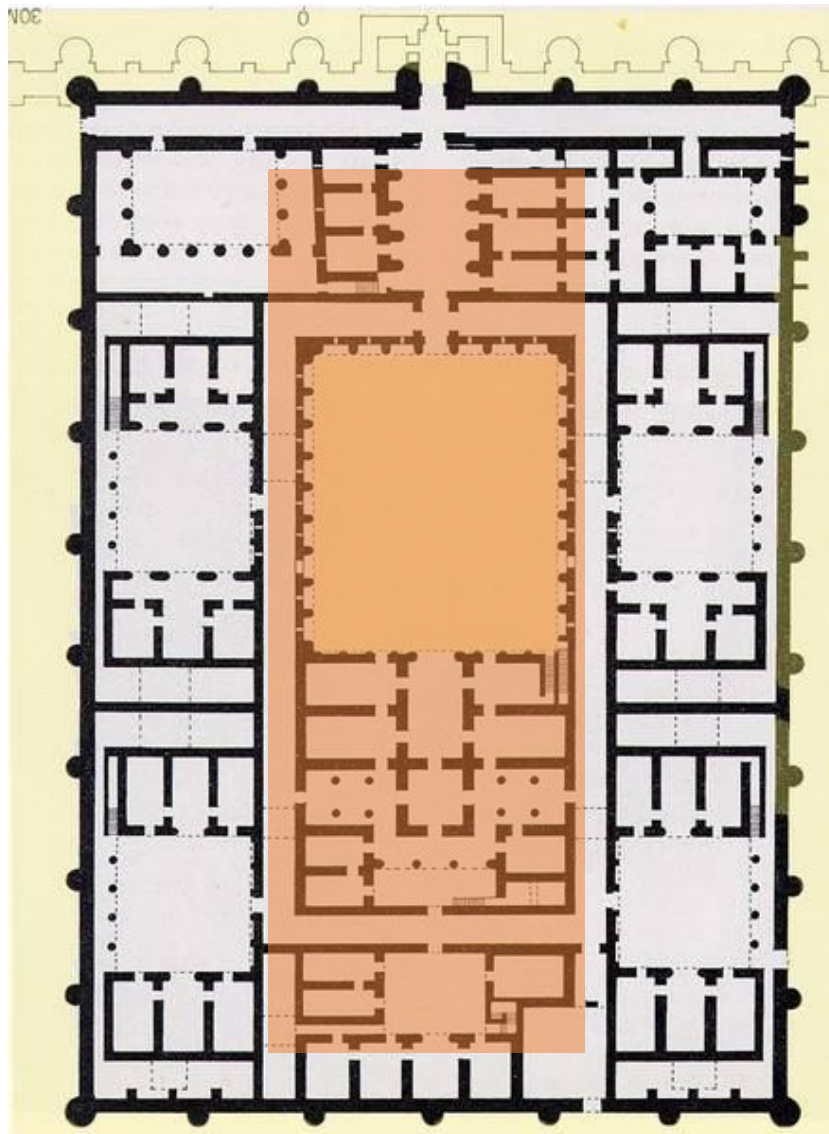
Plan of Ukhaidir. Gardenvisits.com.
